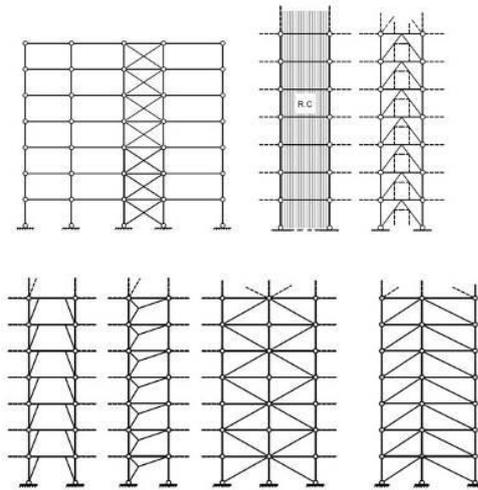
Braced steel frames and reinforced concrete (RC) shear walls
